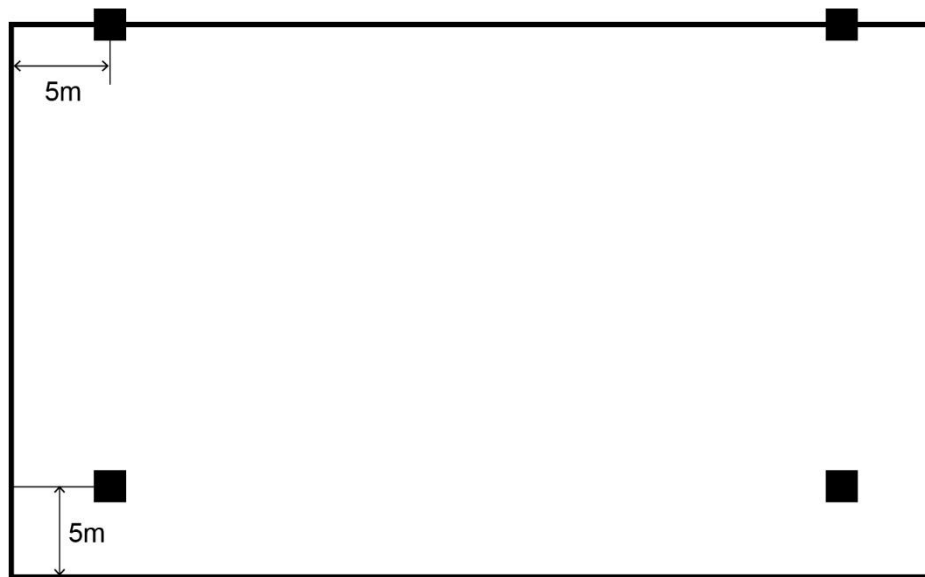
Plan image utility shed roof with 3 overhanging spans. Squares indicate column locations
